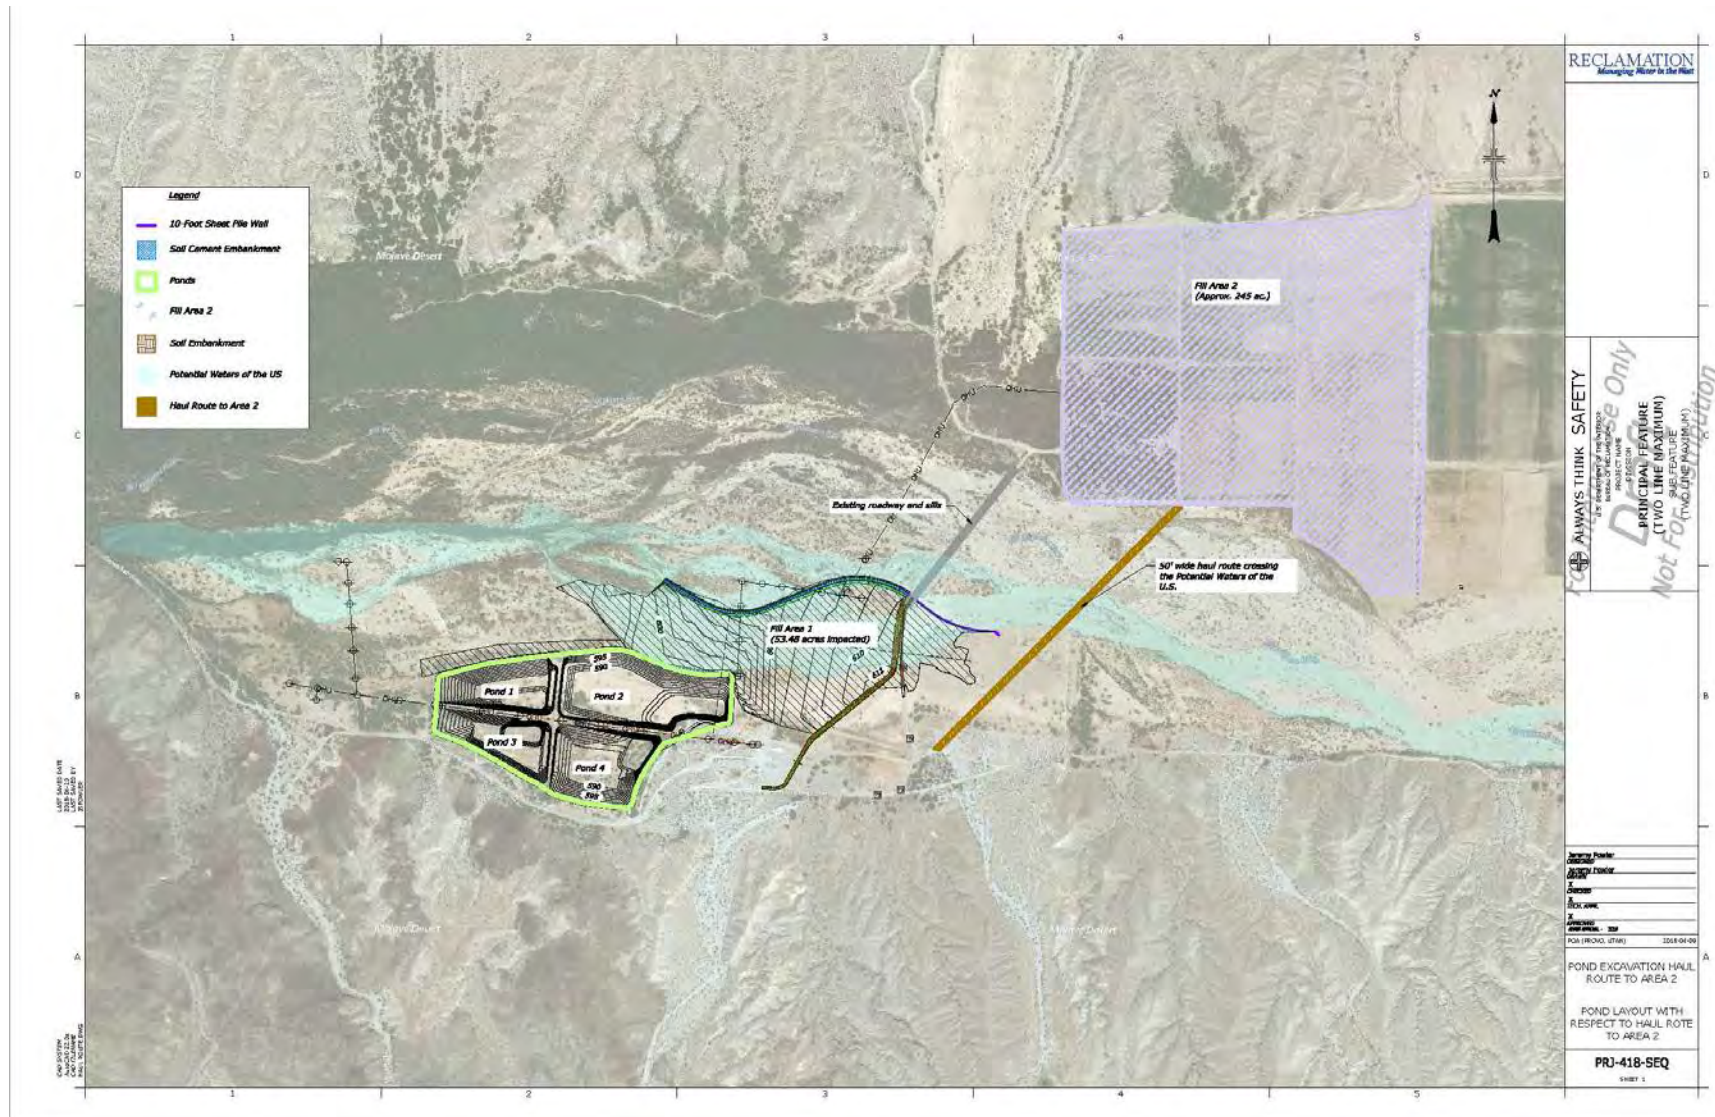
Flood Control Structure Design showing potential Waters of the U.S. and Fill Areas
